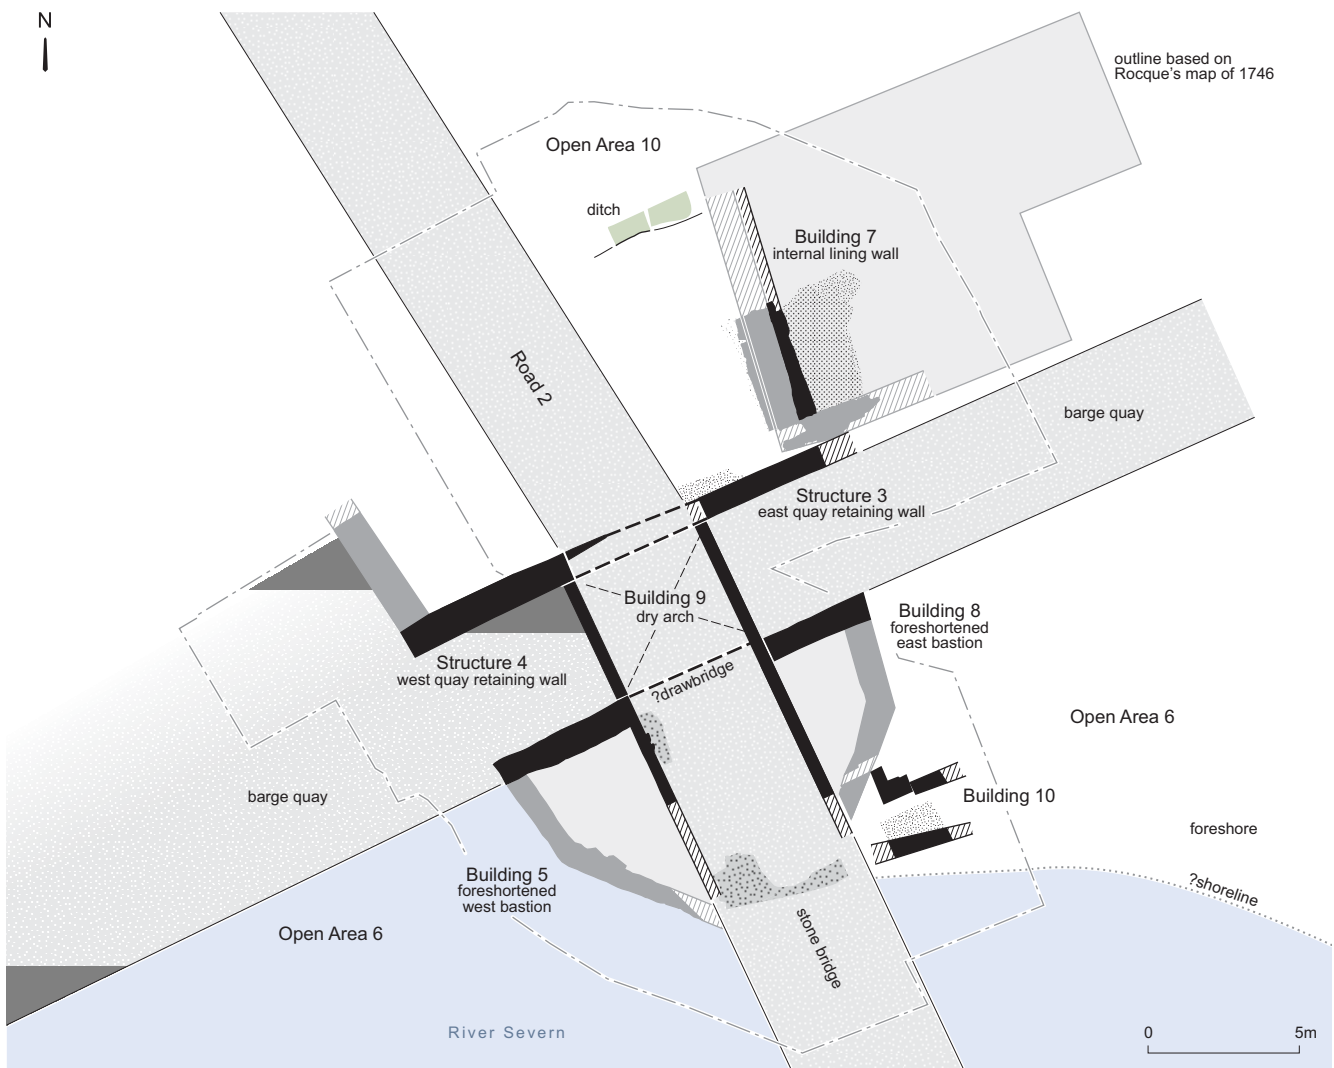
Plan showing the east and west quay retaining walls (S3, S4) along the barge quay, the dry arch (B9) and east and west bastions (B5, B8), buildings (B7, B10) to the east of the bridge and bridge approach activity (OA10) east of the road (R2), period 5 (scale 1:250)
